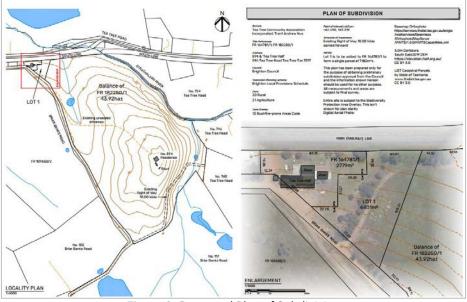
Proposed Plan of Subdivision (Please refer to the attached file PDA 53605CT-P1 for complete Plan of Subdivision)
